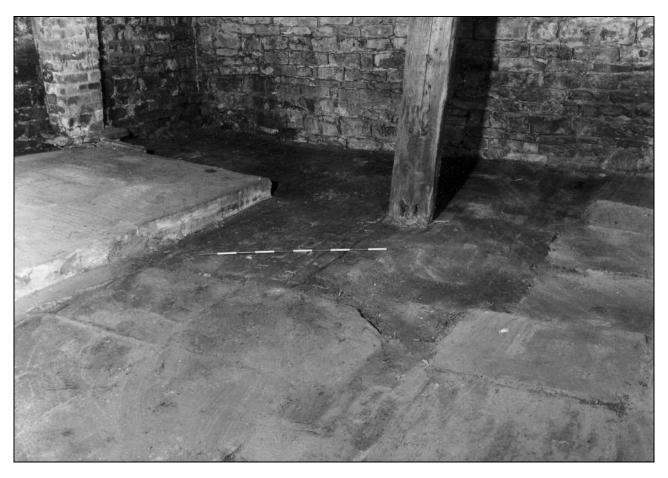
Building 1a: detail of floor surfaces in ground floor, from the south-east (film 3, frame 14)
